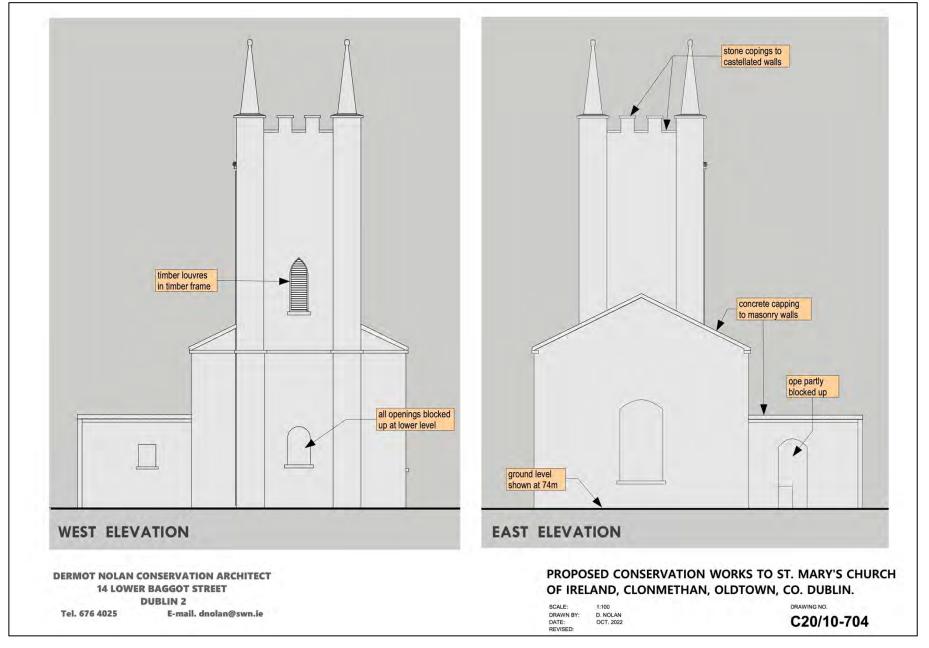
East and west elevations of St Mary's Church (Nolan 2022).
